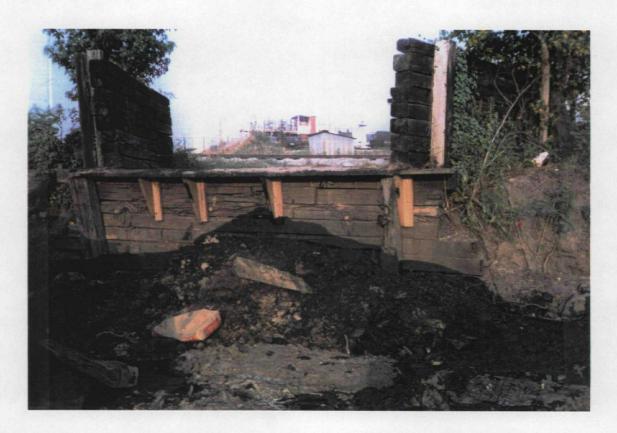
Roll № 1 Frame №: 23 Date: 6/25/92 Subject: The unloading dock located near the drum recycling area. Location of HI-SS-02. Notice the stained soil and stressed vegetation.
